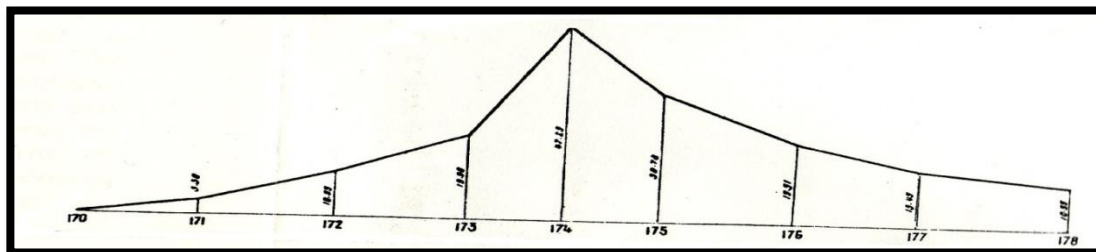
Oil and gas elevation schematic in Sahara (refer above)
